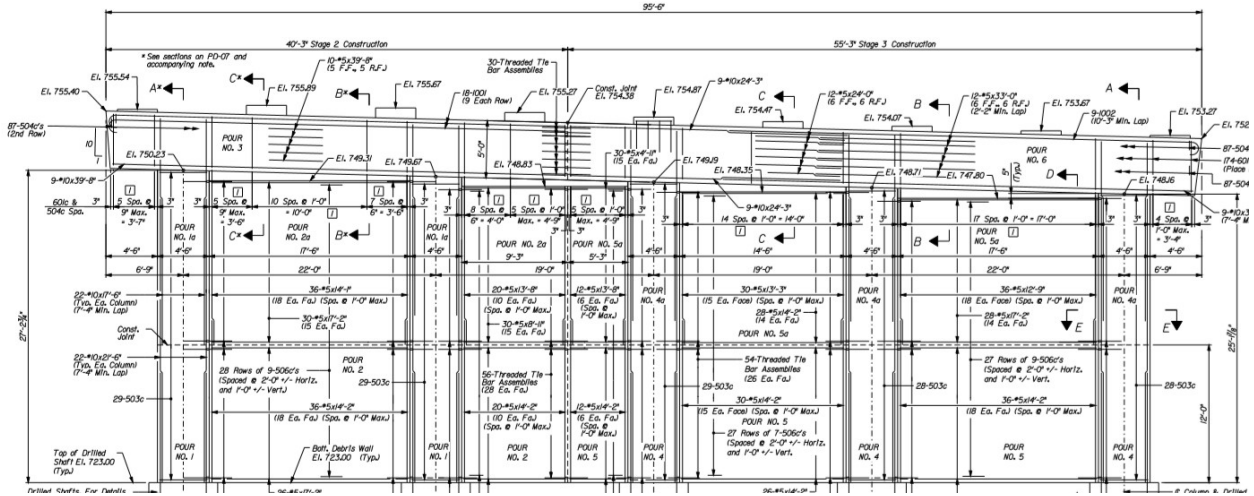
Transverse Elevation of Interior Pier 2 (NBI 50795) (2009)
